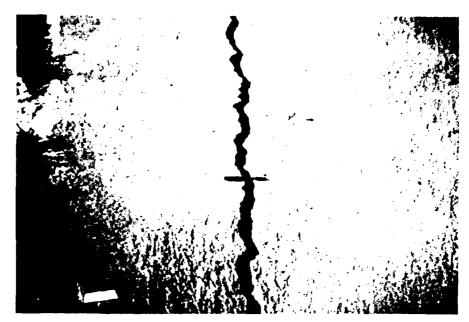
High severity longitudinal crack, jointed rigid pavement, case 2
